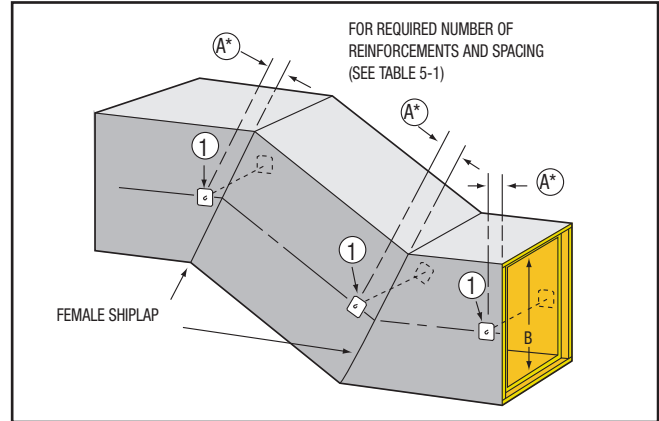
B. Offset Reinforcement, Cheek Panels With Butt Joints
